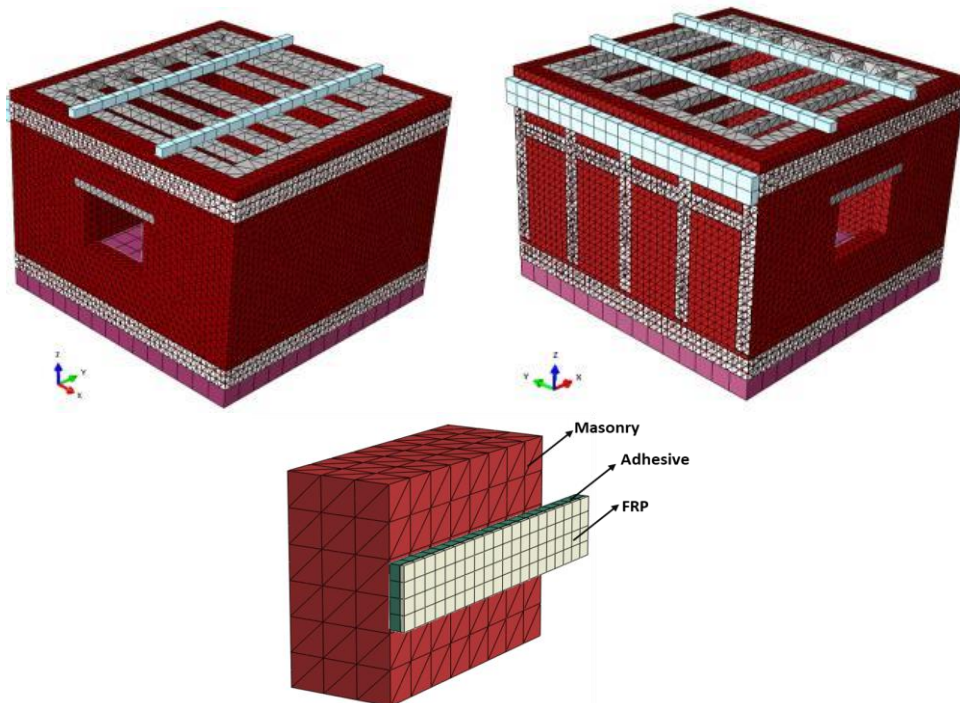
FE model of the retrofitted masonry house and the detail of the FRP reinforcement.
